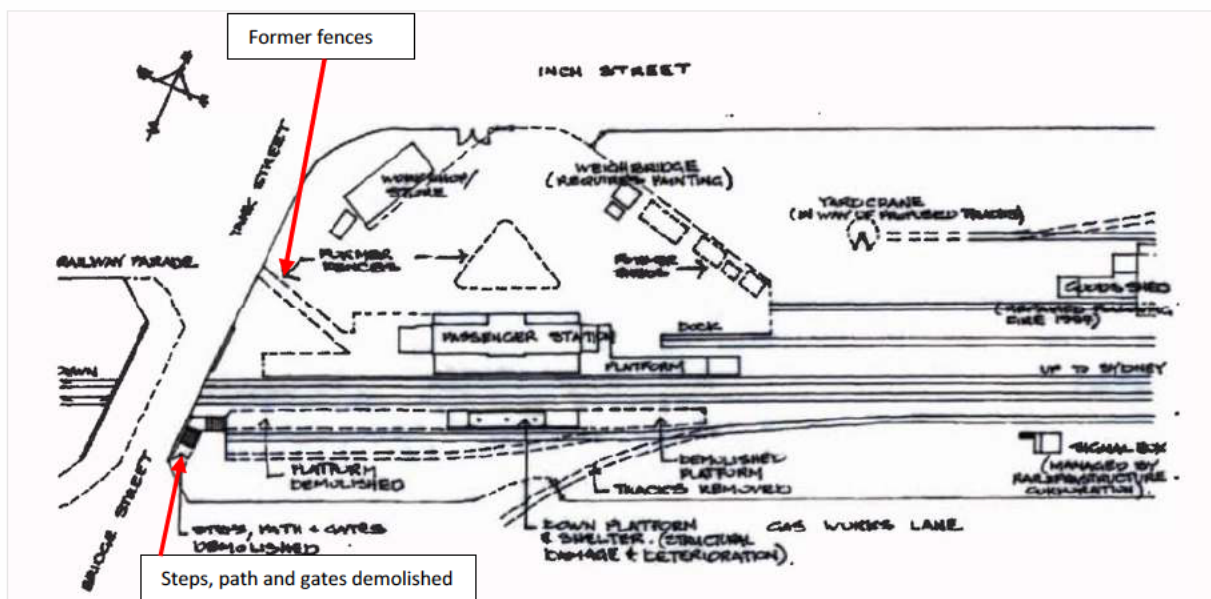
Eskbank Railway Station - 2000 Site Plan (Source: Otto Cserhalmi and Partners Pty Ltd 2007, p.92)
